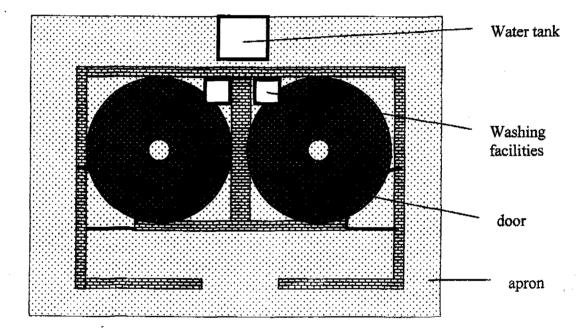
floor plan of double pit latrine for senior girls with blind walls and showing girls washing faculties, doors and water tank
